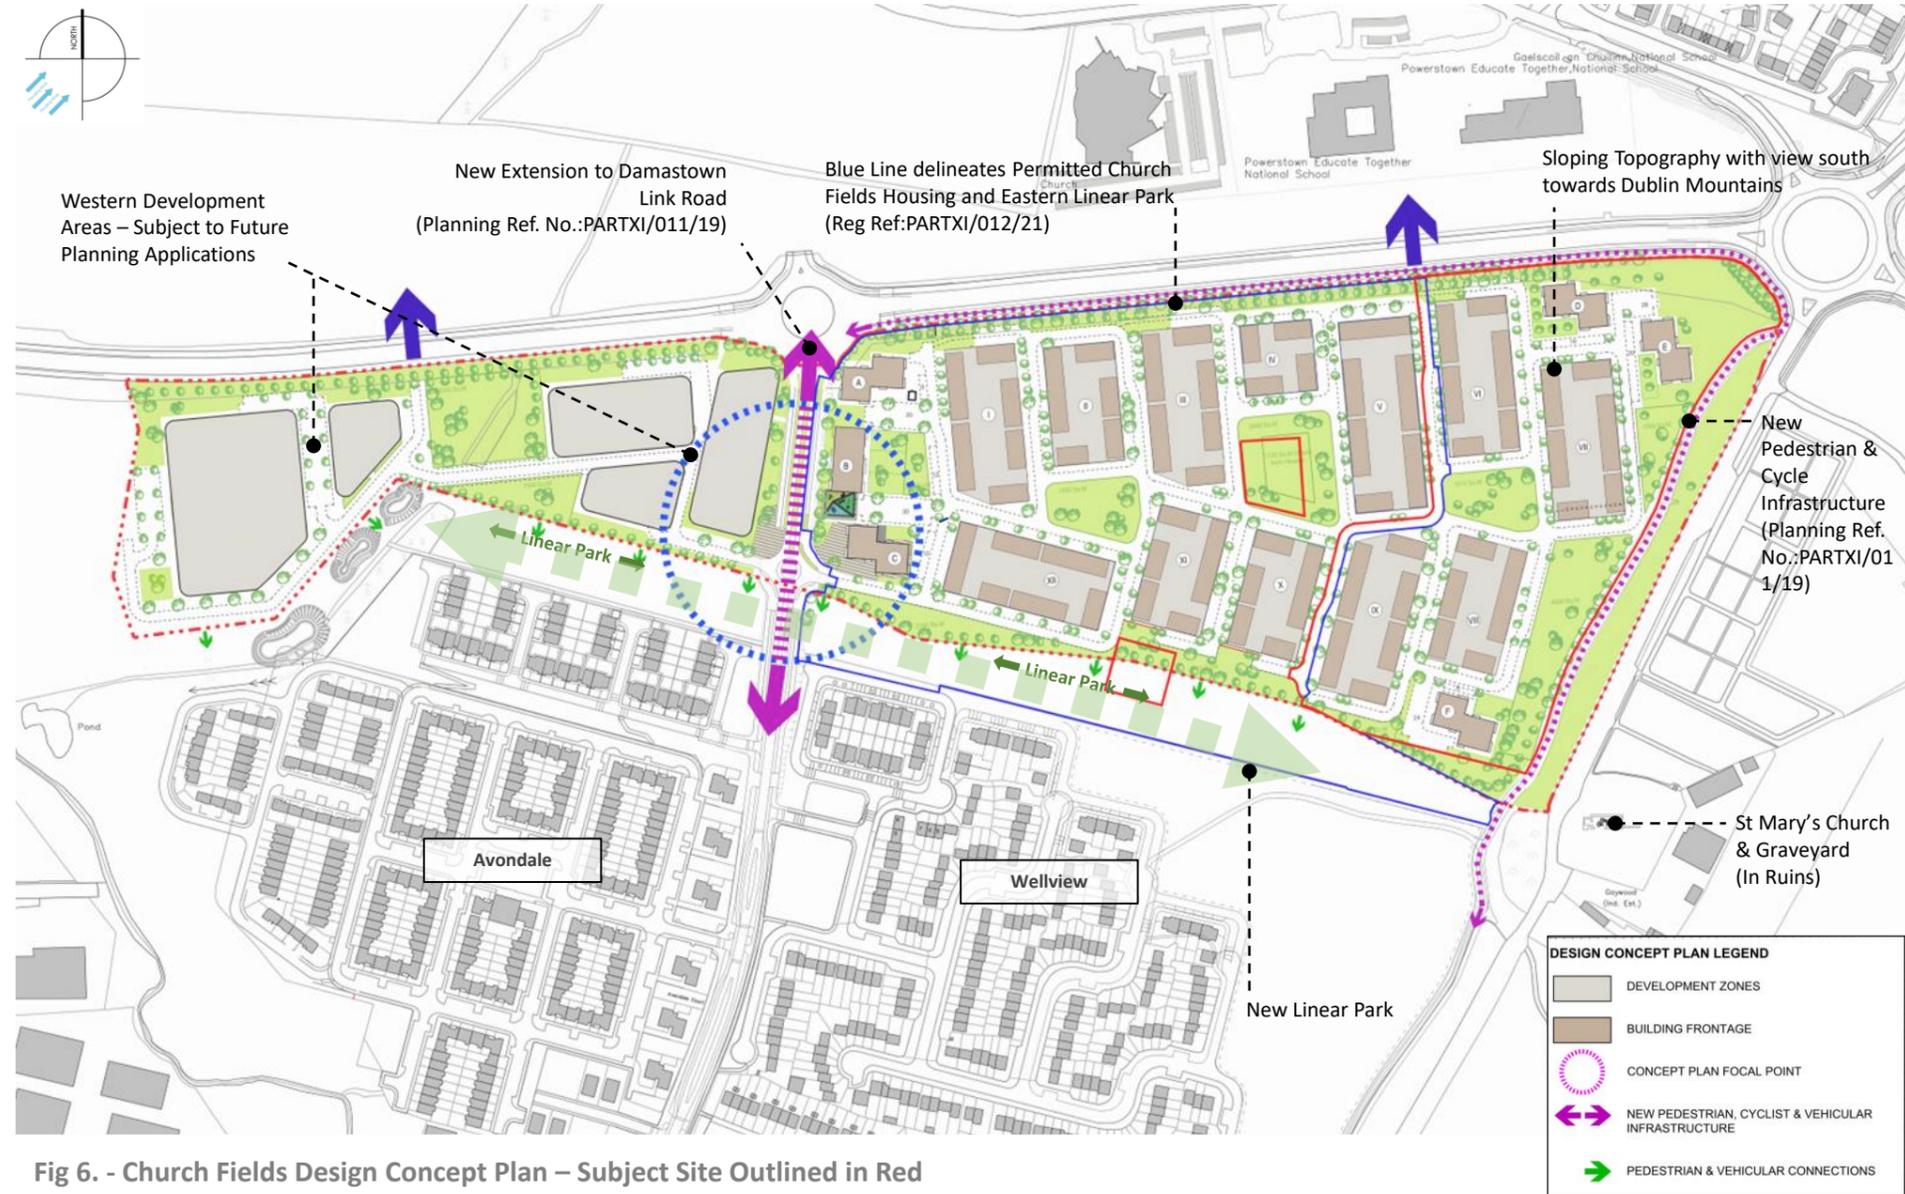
Church Fields Design Concept Plan – Subject Site Outlined in Red
